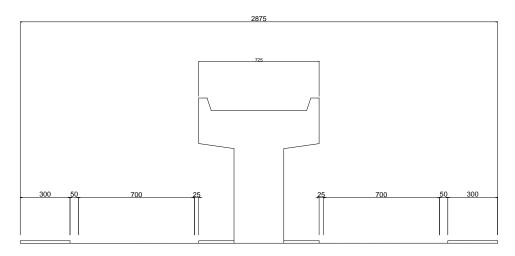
Typical Cross Section of Flyover Section (Alternative B)
